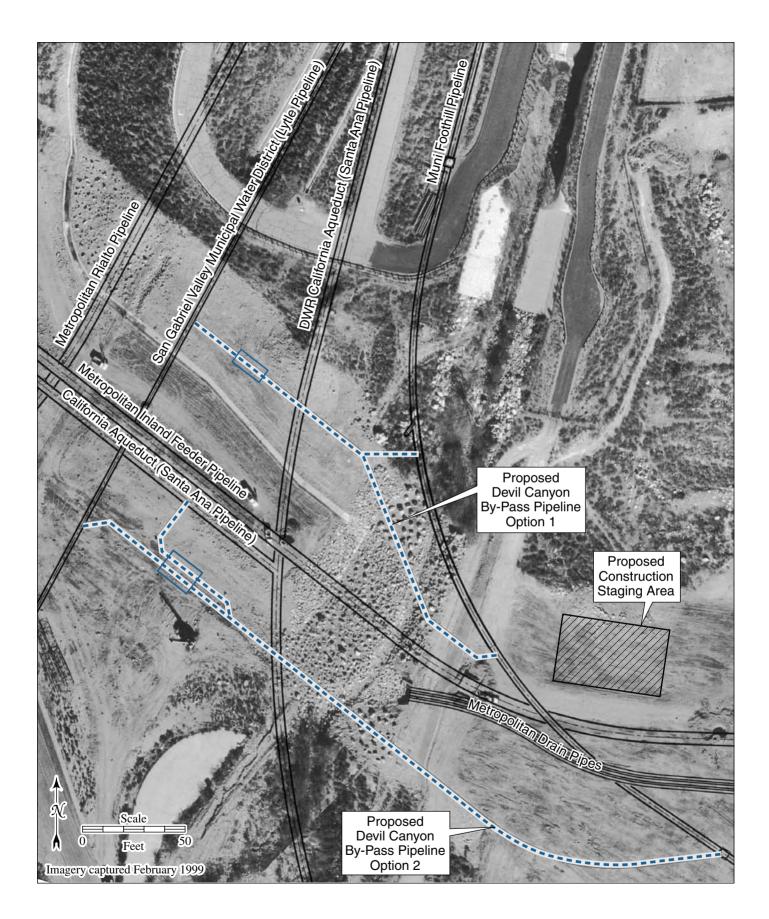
Proposed Project Facilities in Devil Canyon Construction Area
